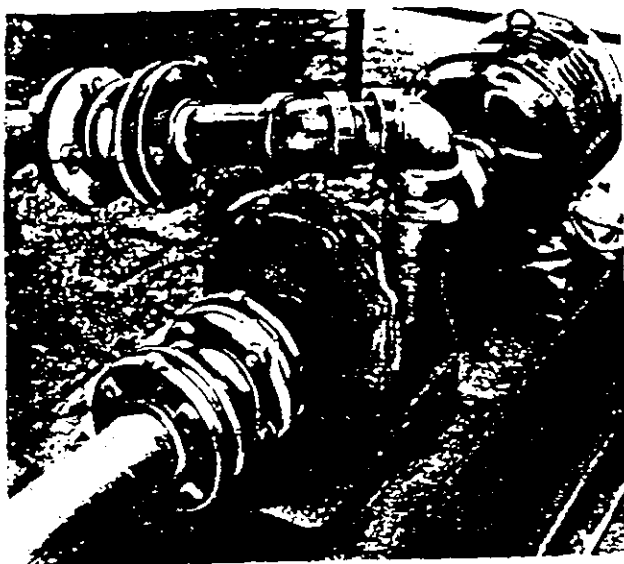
USE OF SPOOL-TYPE RUBBER EXPANSION JOINT PROVIDES PIPE-LINE INSURANCE.
